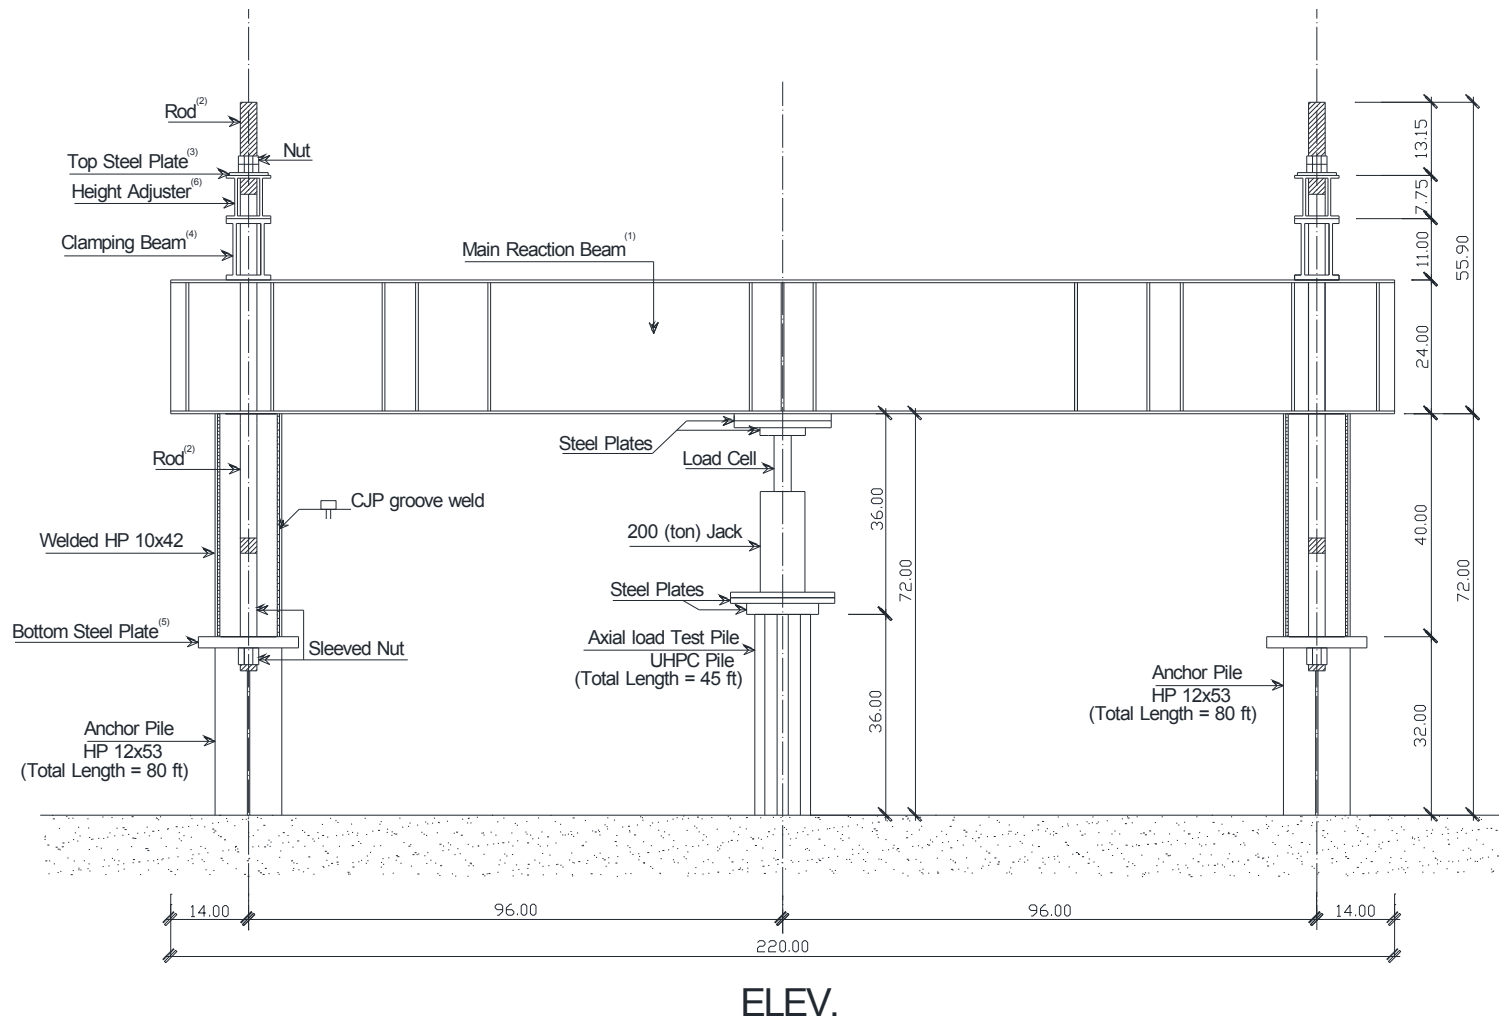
Elevation View of Vertical Load Test Reaction Frame
